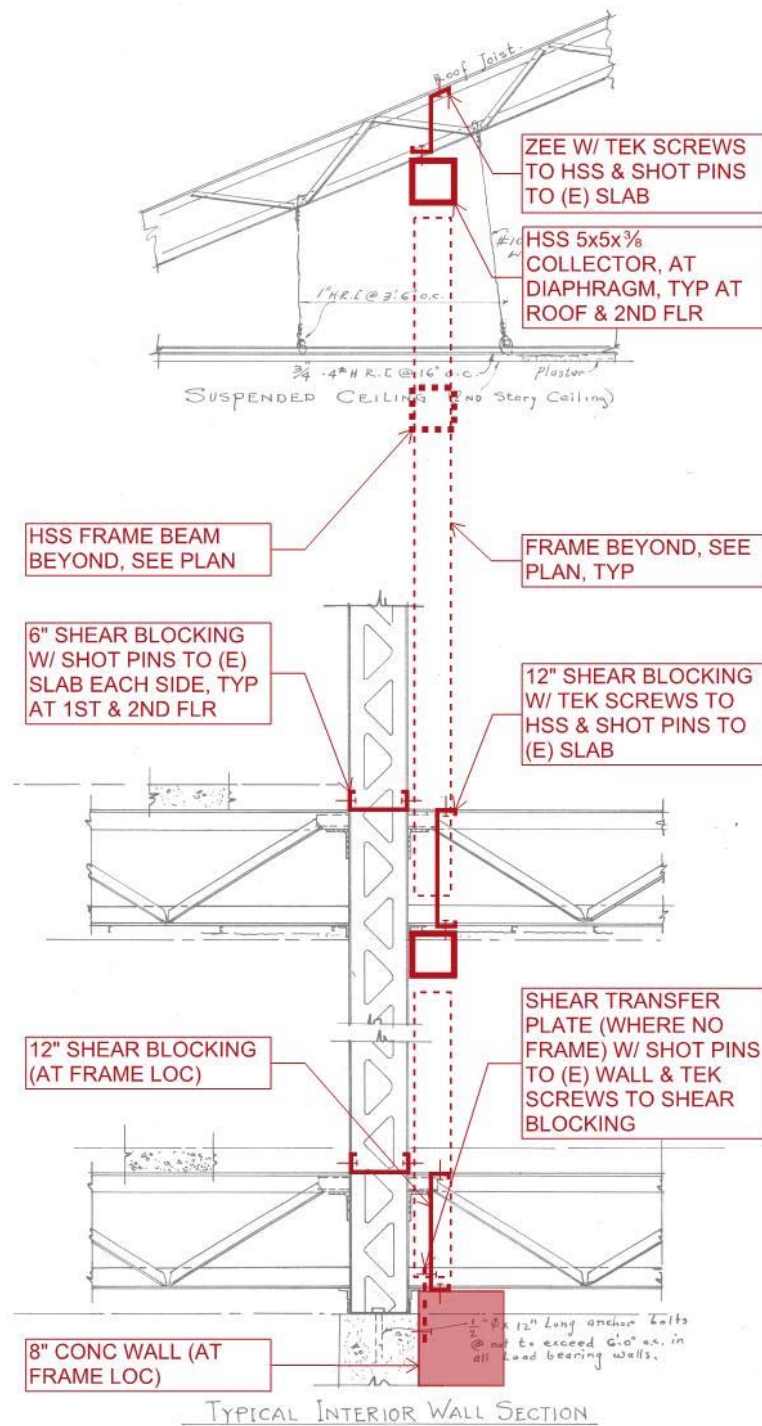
Typical wall elevations at exterior and at corridor walls.
